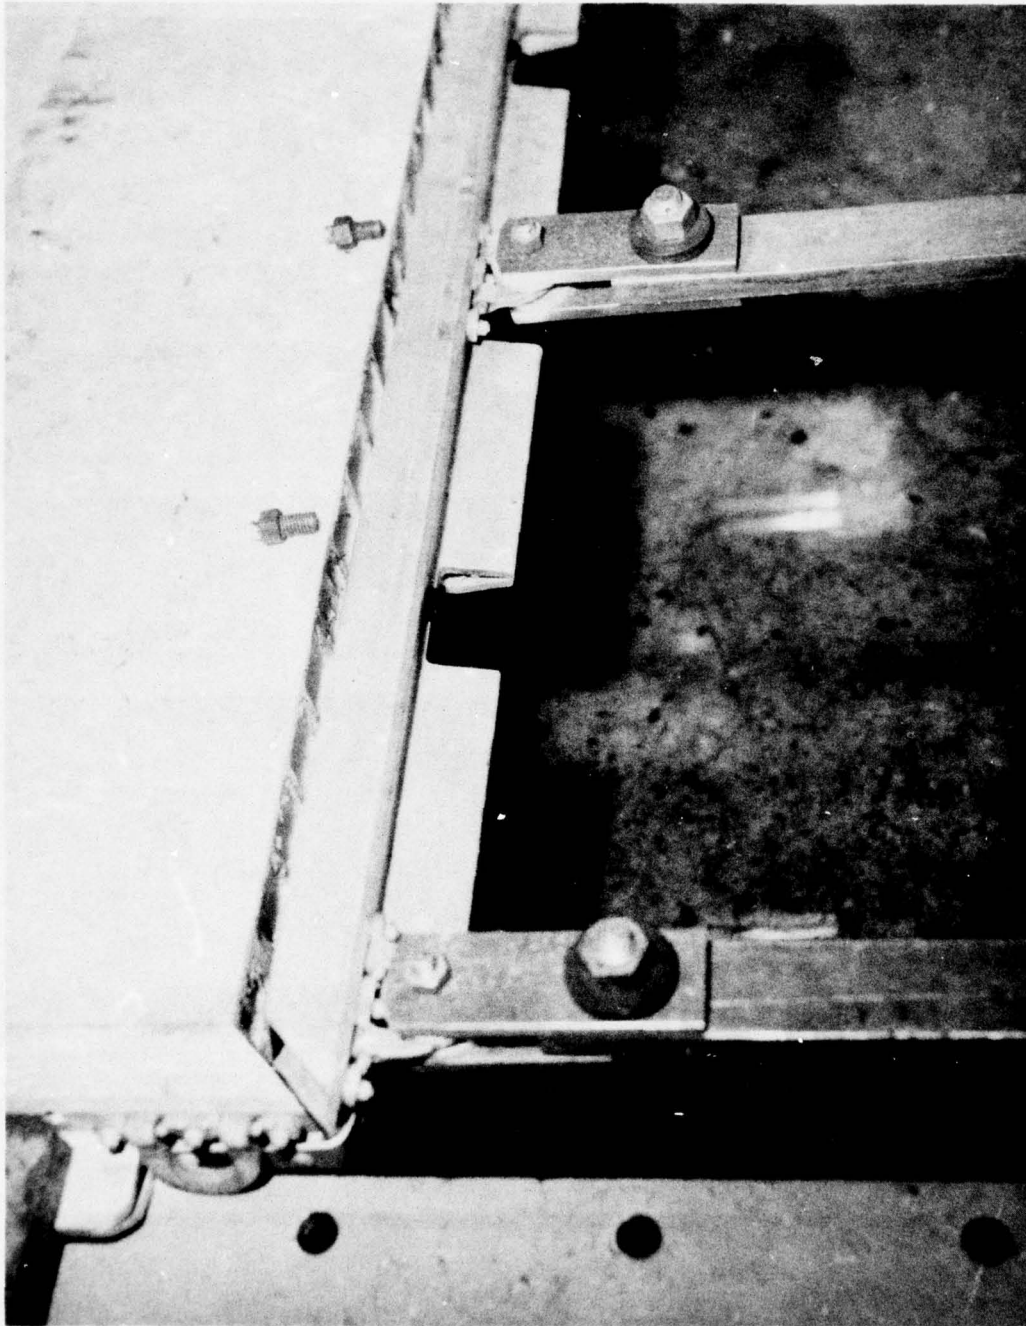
RAIL STRENGTH TEST - ROD FAILURE 108 INCH EDGE
